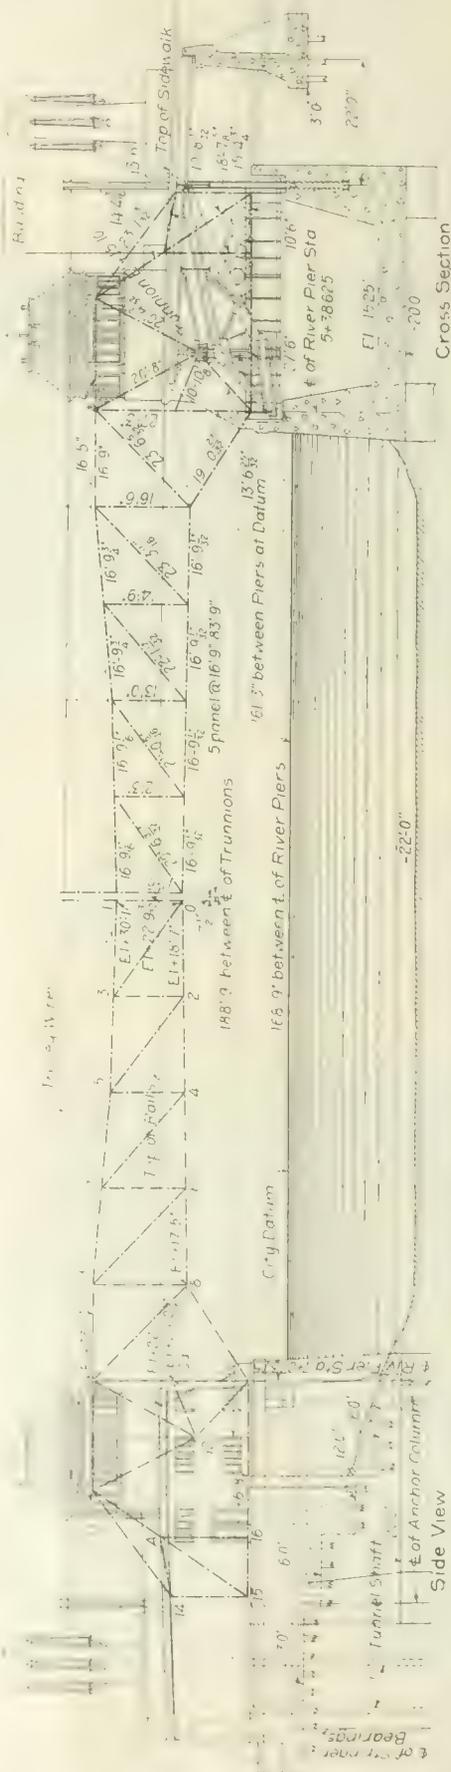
Side Elevation and Longitudinal Section of the Chicago Ave. Trunnion Bascule Bridge, Chicago, Ill., Showing General Design Features.
